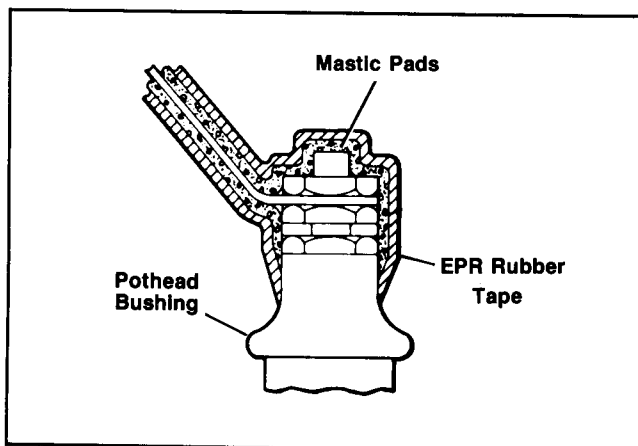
Typical Insulated Taped Joint on Pothead Bushing, 15kV Only
